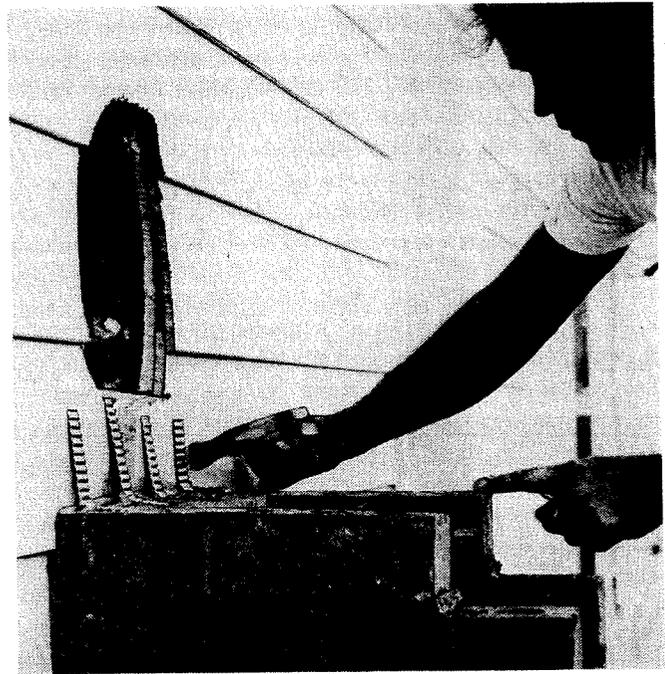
Corrugated steel wall ties placed every sixth course of brick.
